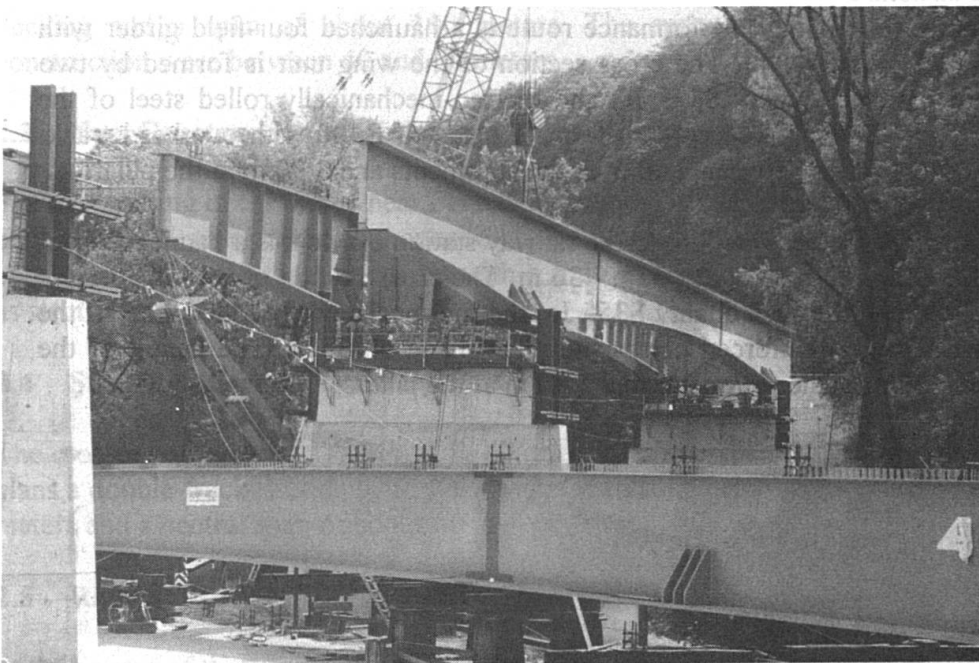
Establishing and connecting the two main girders of the span crossing the river
